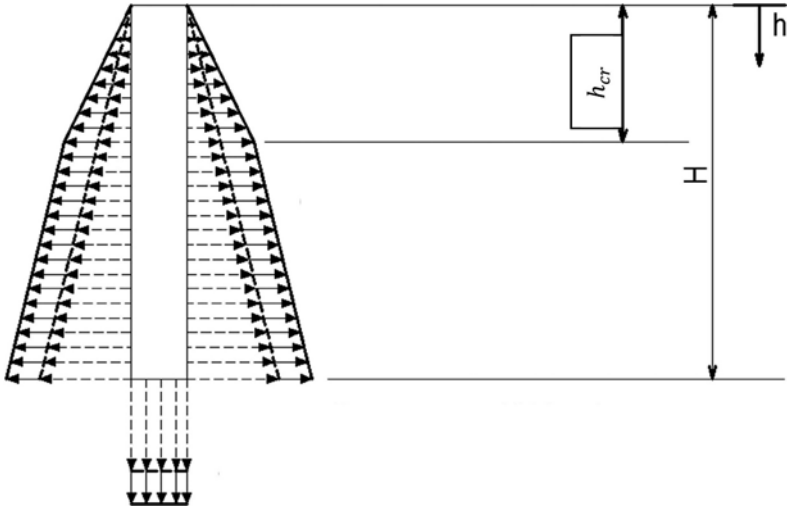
Diagram for determining the pressure on the trench wall during concreting.
